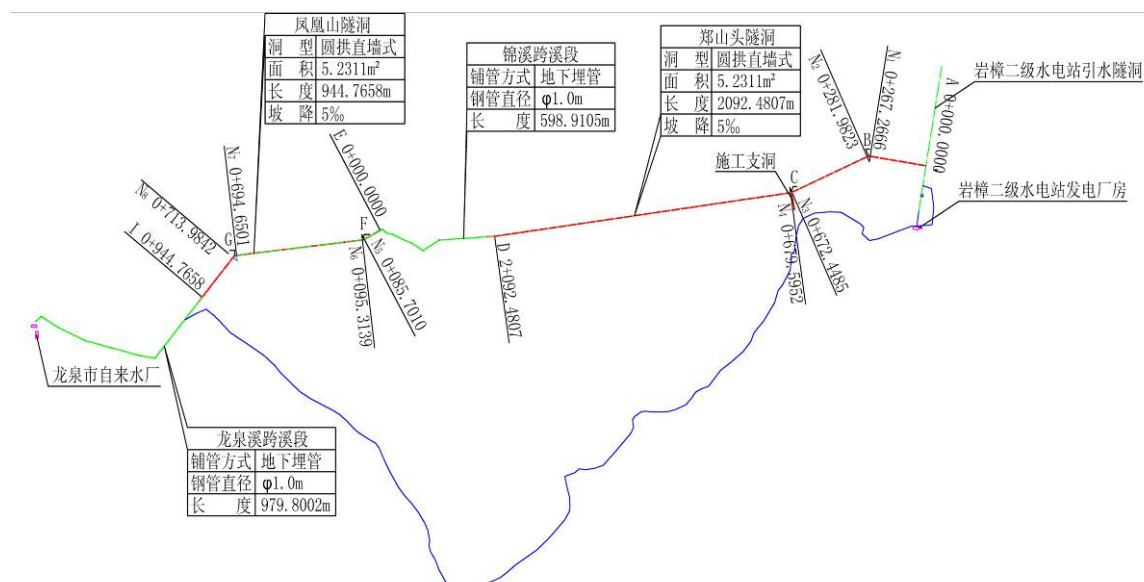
Plan of Water Diversion Project of Yanzhang Stream
